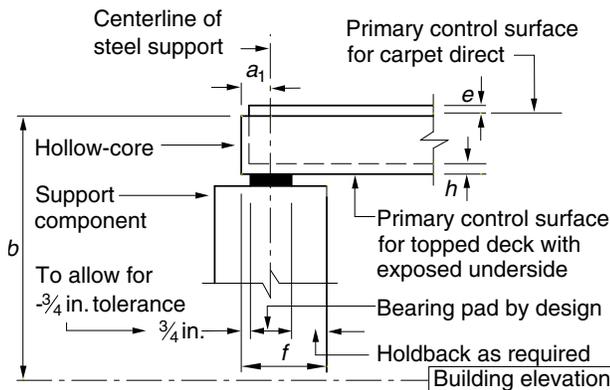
Floor and roof component erection tolerances
